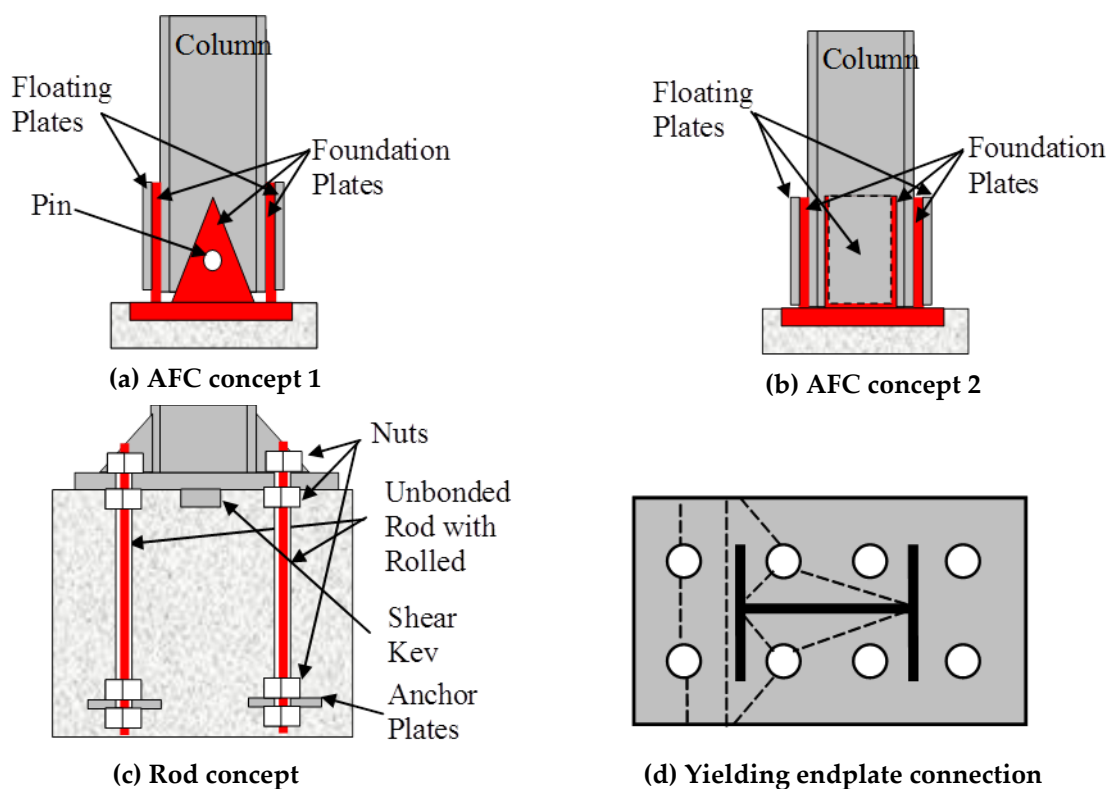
Some Possible Methods for Preventing Column Yielding
